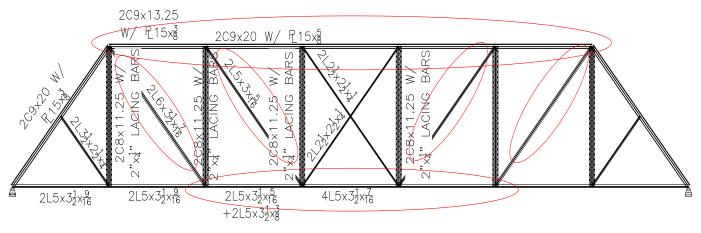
West Truss Members Requiring Strengthening for Vehicular Live Load
